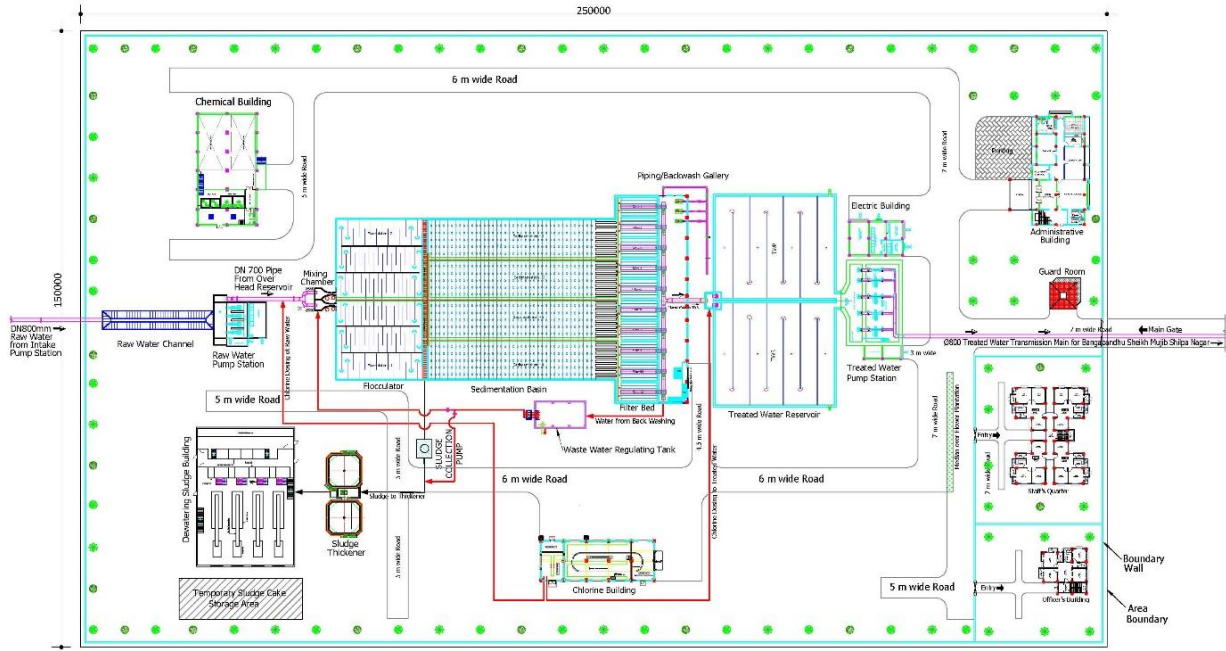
Layout of Surface Water Treatment Plant at Poshchim Inkhali
